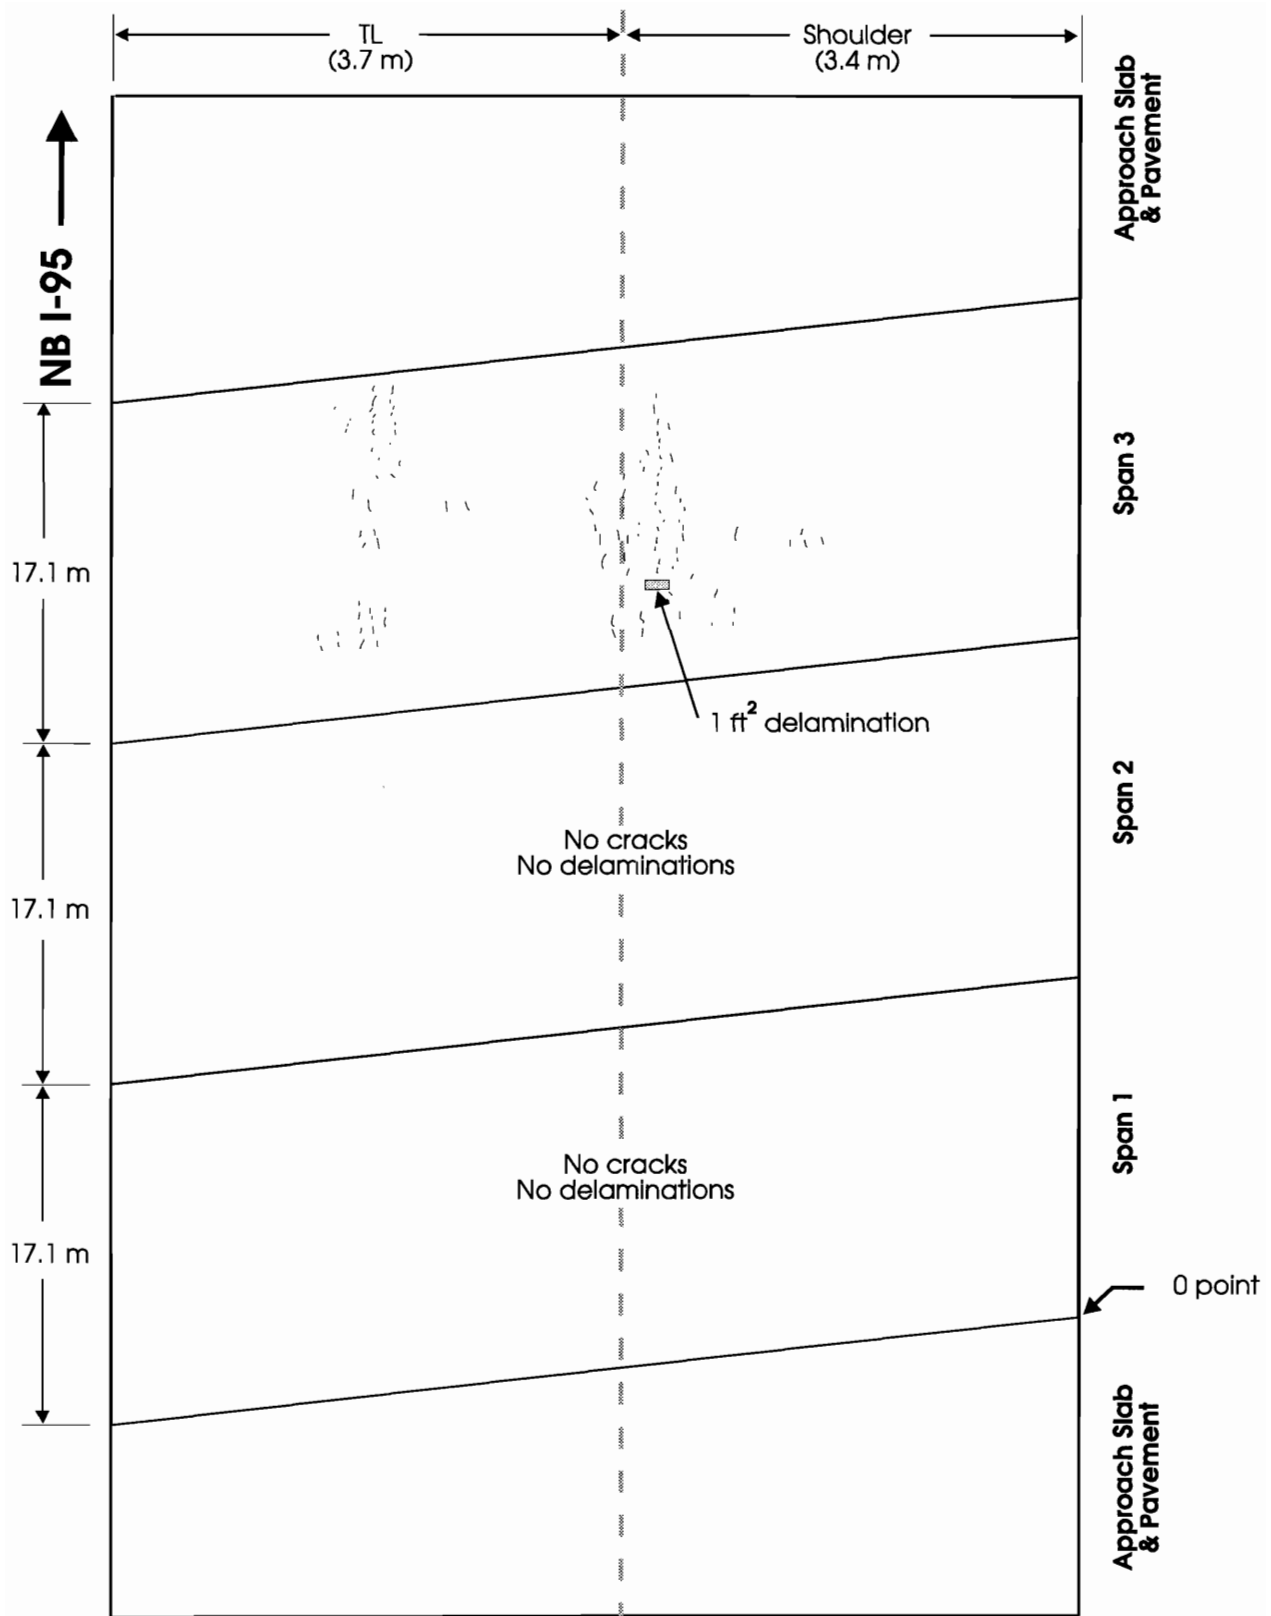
Cracks and delaminations in Bridge 2 NBL, TL and shoulder.
